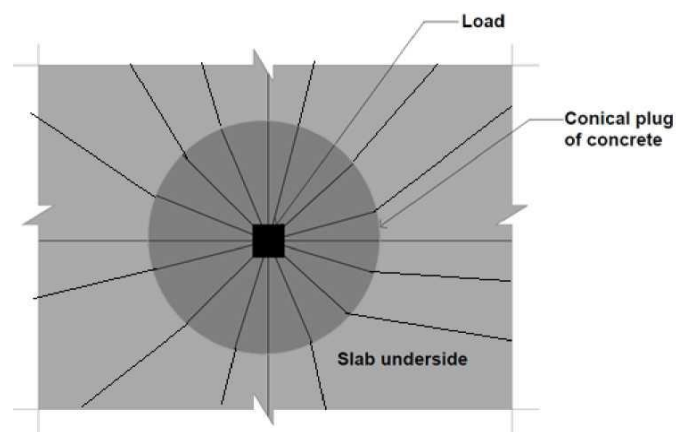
Punching shear failure on the underside of the bridge deck due to concentrated load
